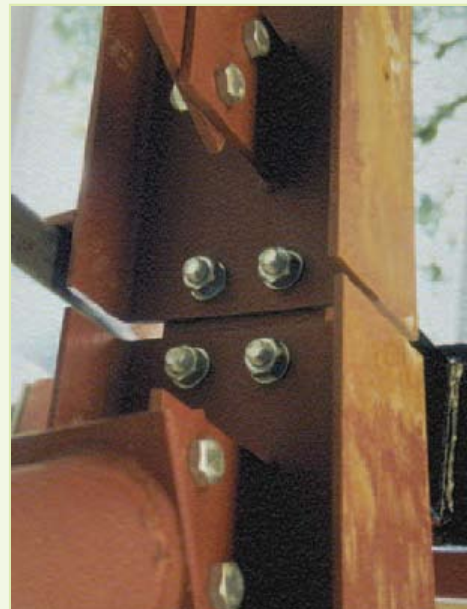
· Bolted connections allow disassembly facilitating easier reuse
